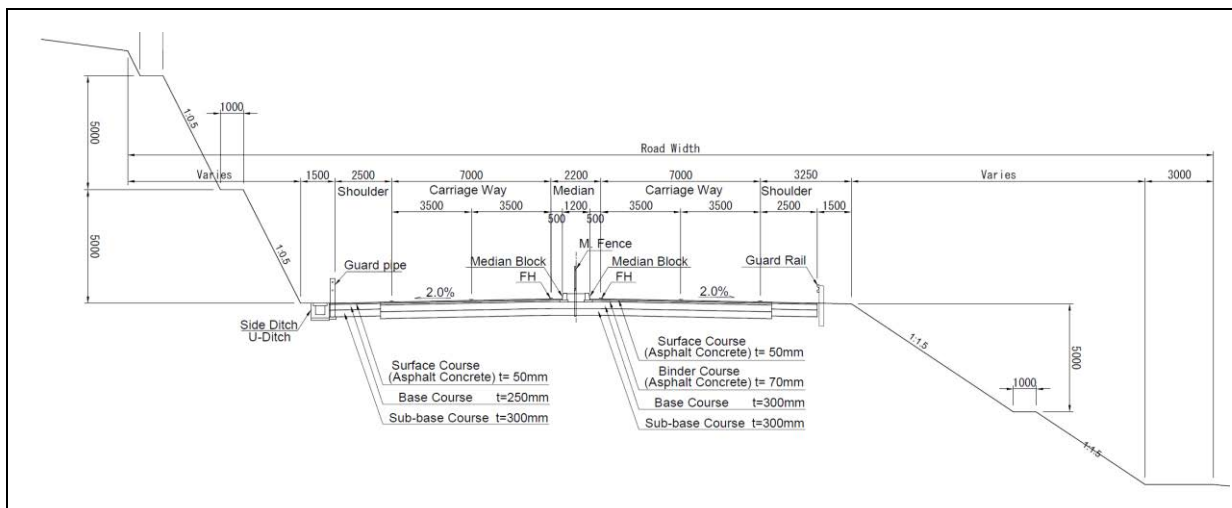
Typical Cross Section (Nalinchowk – Sanga Alternative Route: Earth Section)
